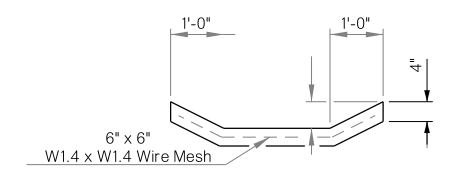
DETAIL OF APPROACH SLAB AT ABUTMENT WING
